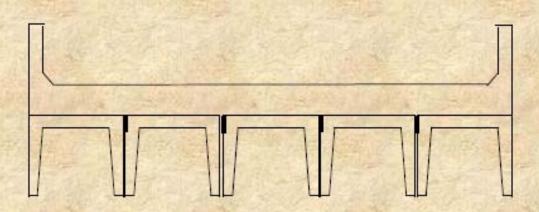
Cast-In-Place Concrete Slab over Precast Concrete Channel Sections with Shear Key.
